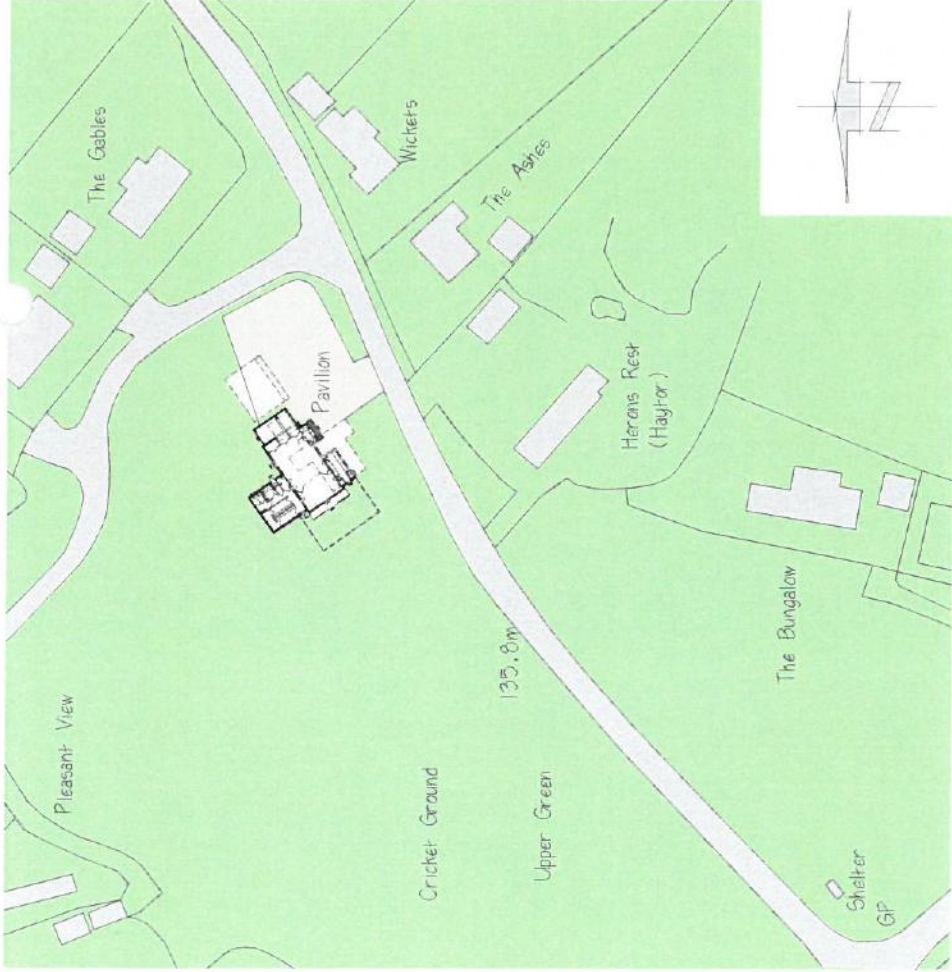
LAN SK.02CProject :- Langley Club House & Village Hall
